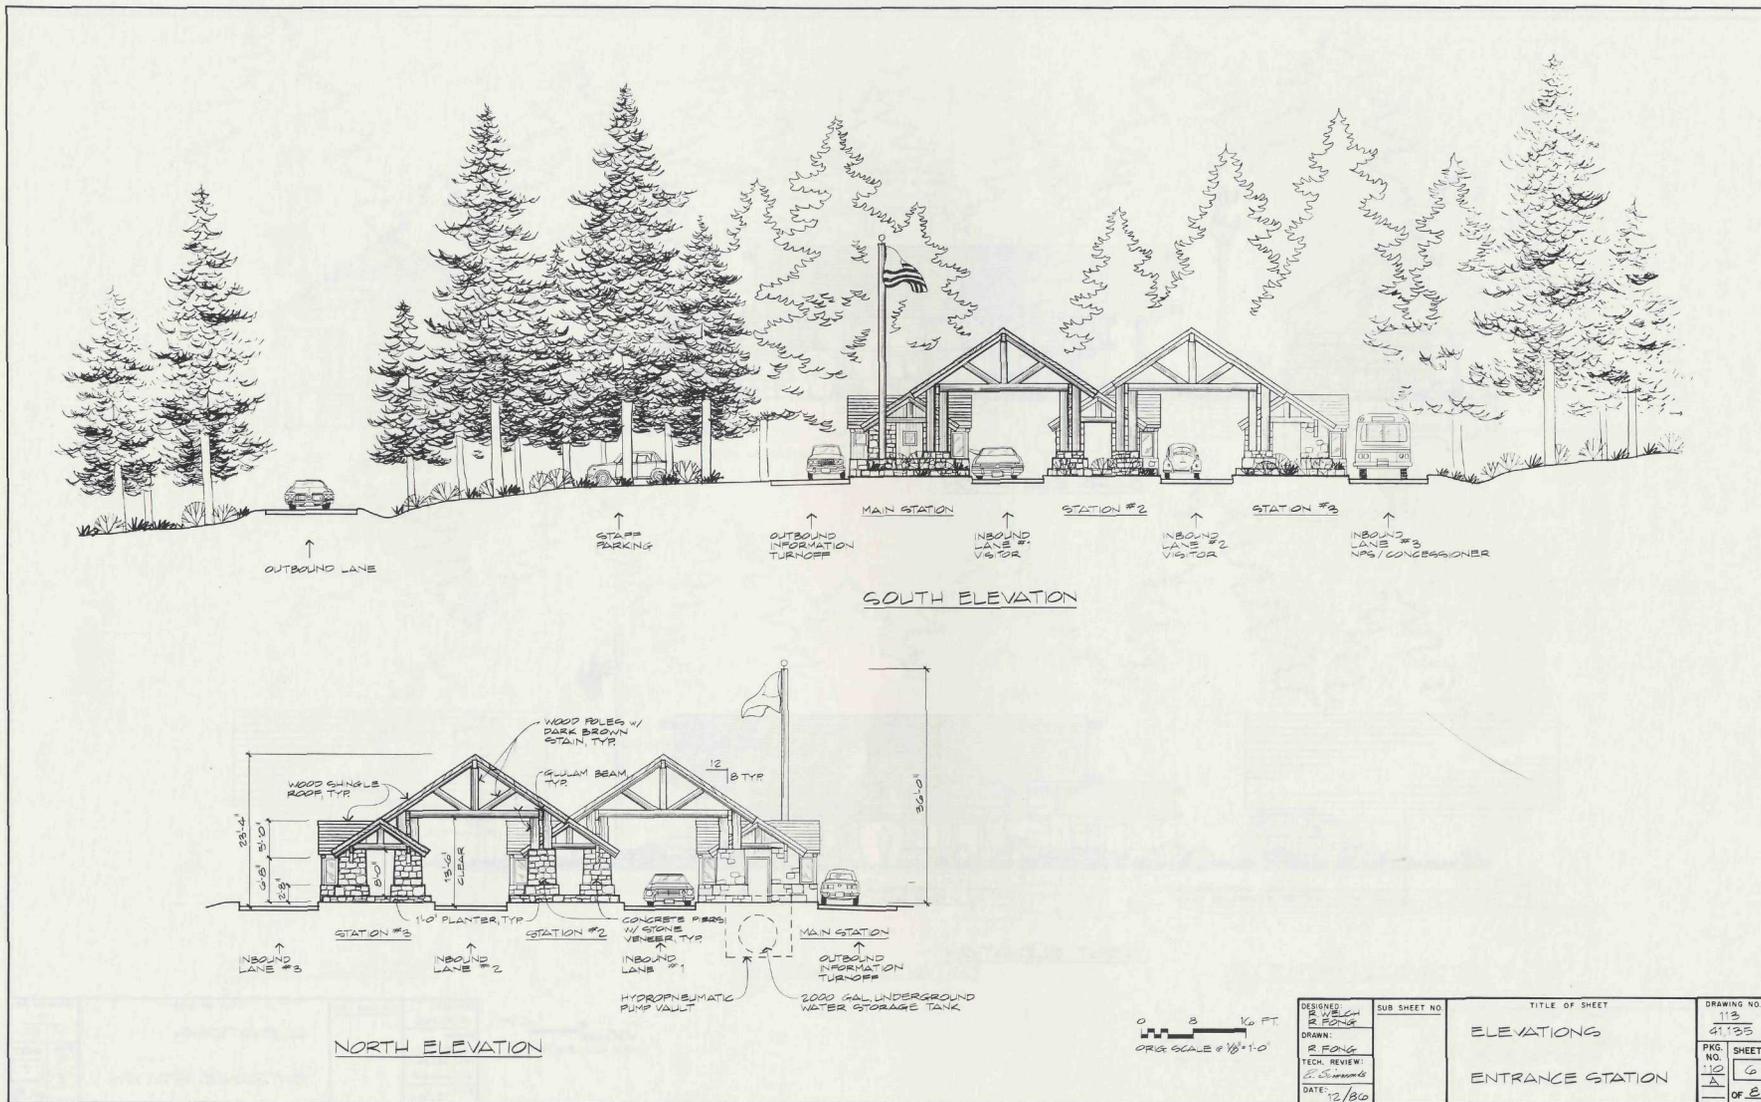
Elevations, Proposed South Rim Entrance Station, Grand Canyon National Park
